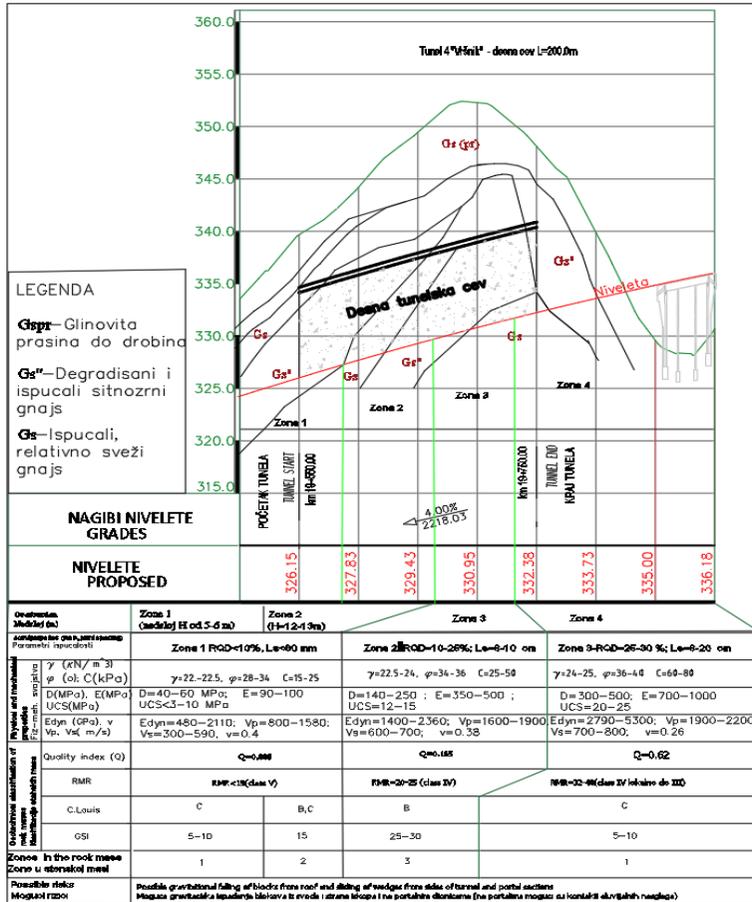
Geotechnical section for the right tunnel pipe of the Vršnik Tunnel [4]
